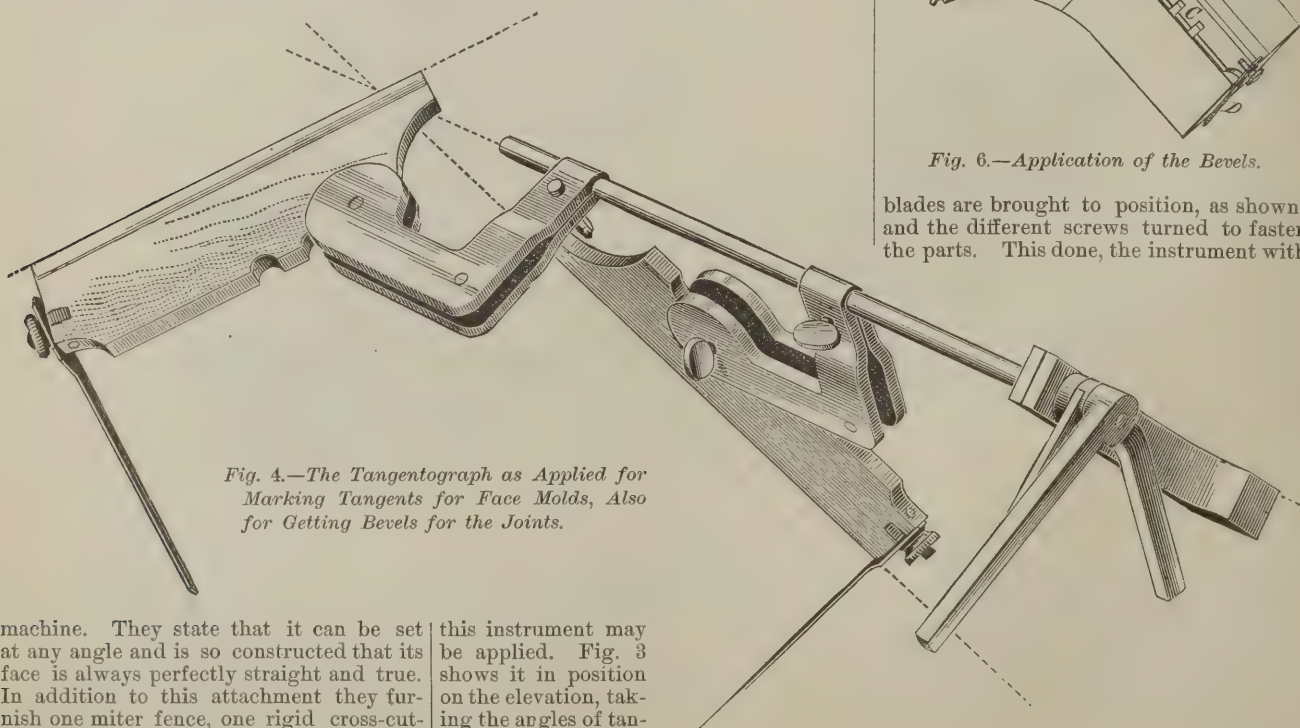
The Tangentograph as Applied for Marking Tangents for Face Molds, Also for Getting Bevels for the Joints.
